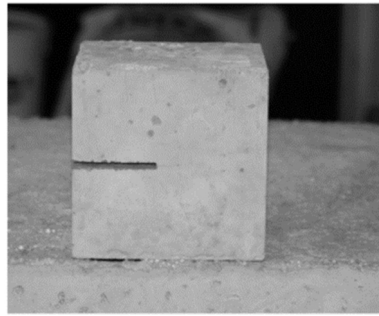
Test specimen with a 70 mm notch used to slip cubes after exposure [68].
